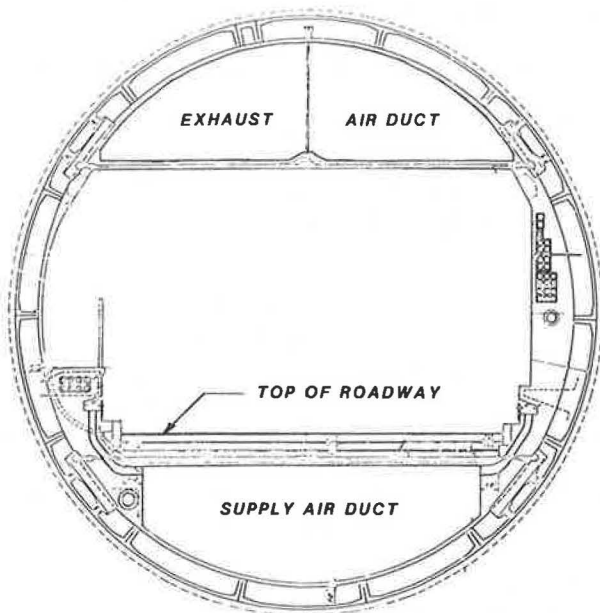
Transverse cross section of Holland Tunnel tubes.
